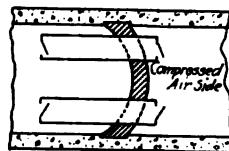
Domed brick air bulkhead at East Boston Tunnel.
